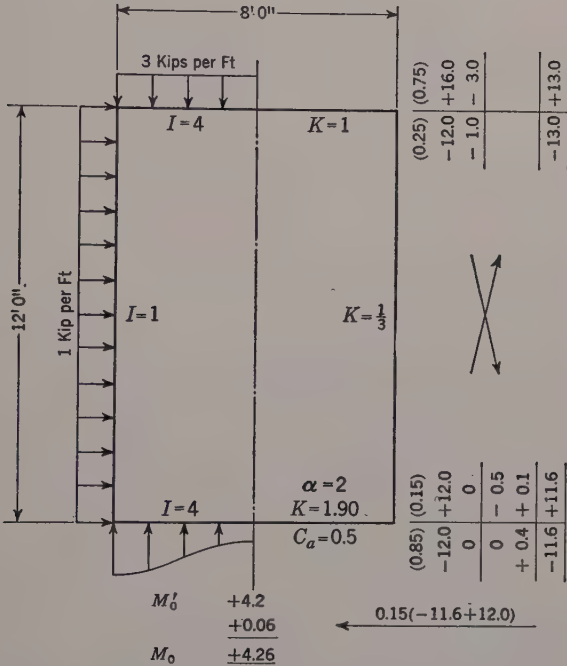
RECTANGULAR CONDUIT (AN INDETERMINATE STRUCTURE)
